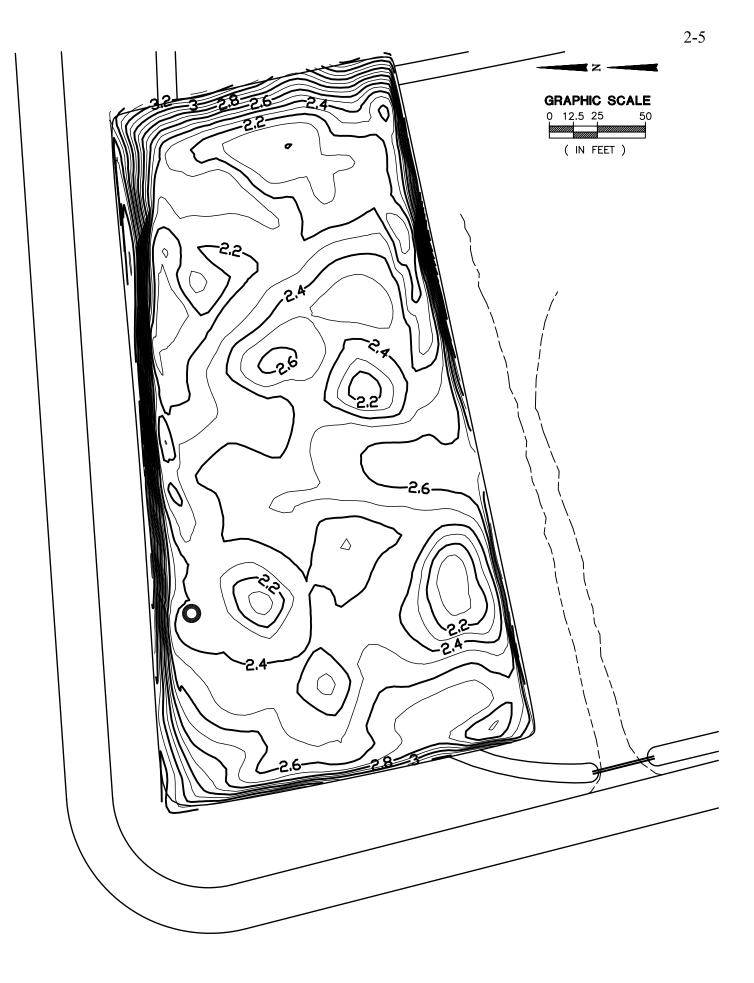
Elevation Contours for the Dry Detention Pond (Ft. NGVD).
